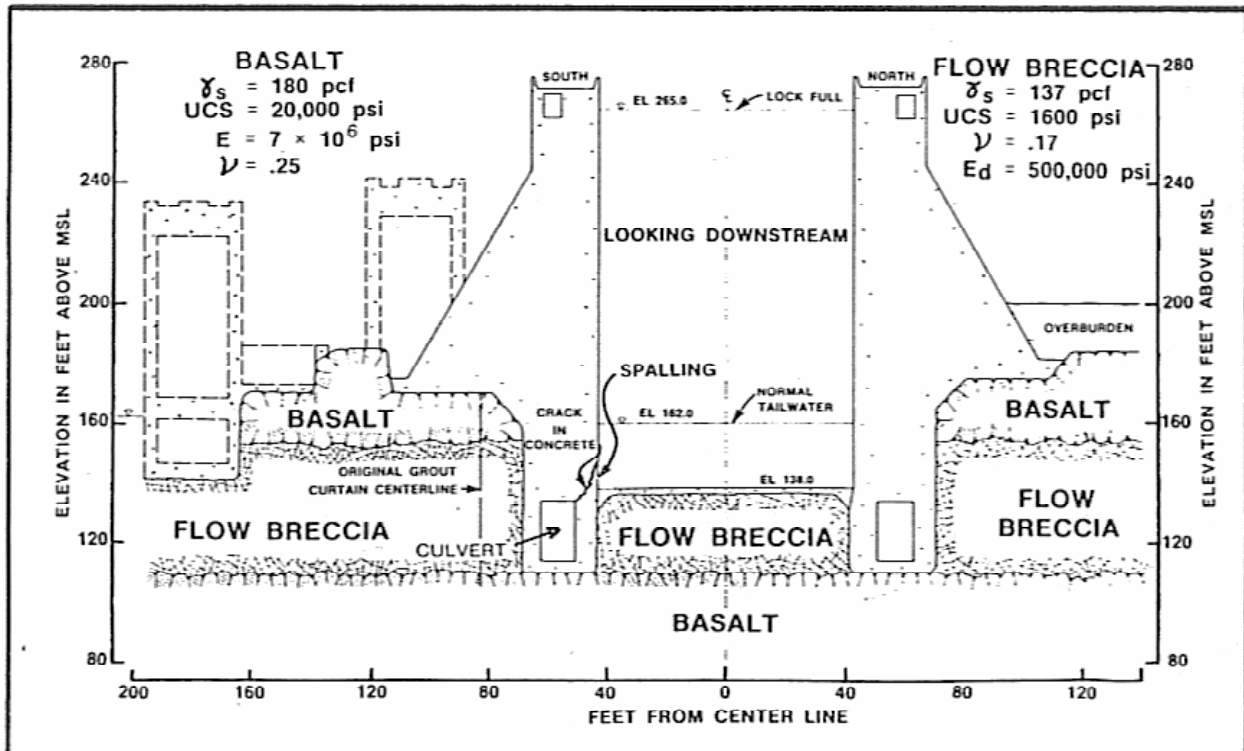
Cross section of lock, John Day Lock and Dam (51).
